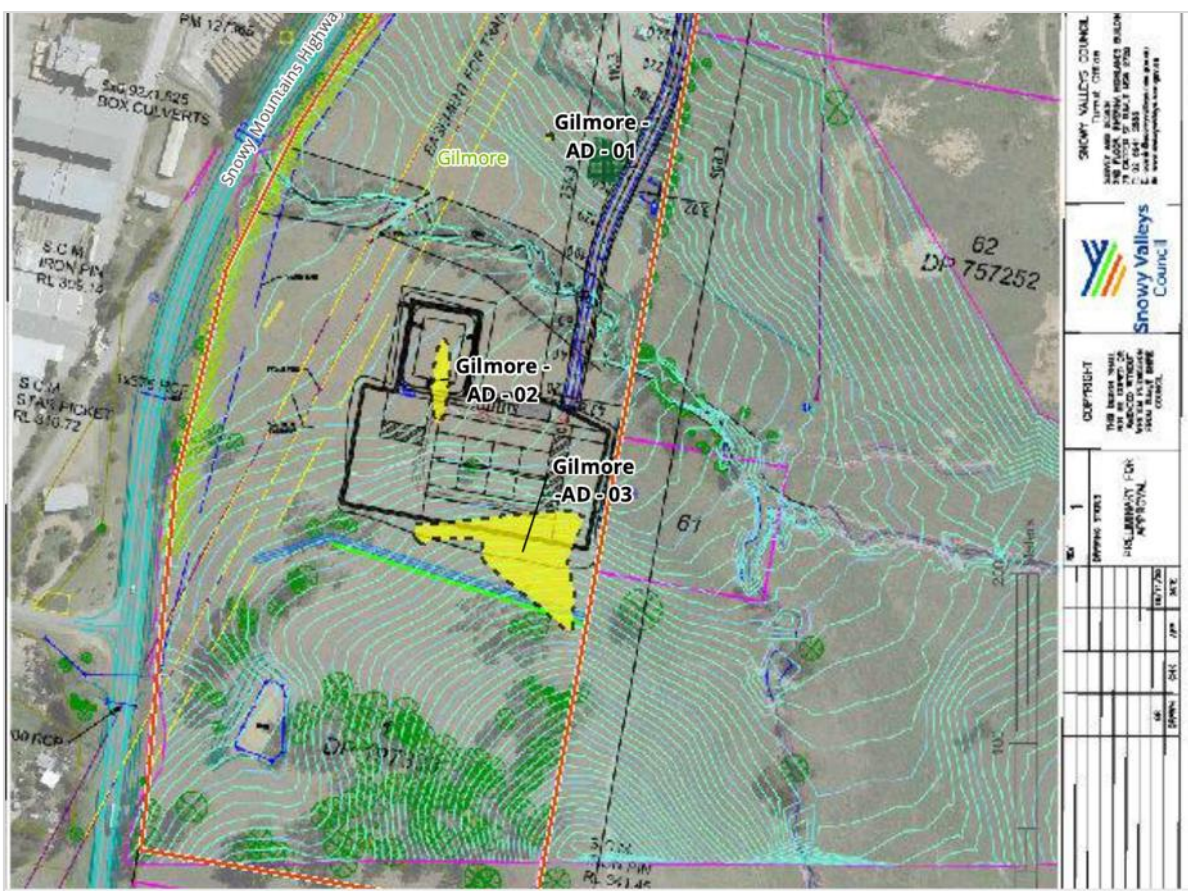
Identification of aboriginal sites with test excavations with proposed site layout overlay
